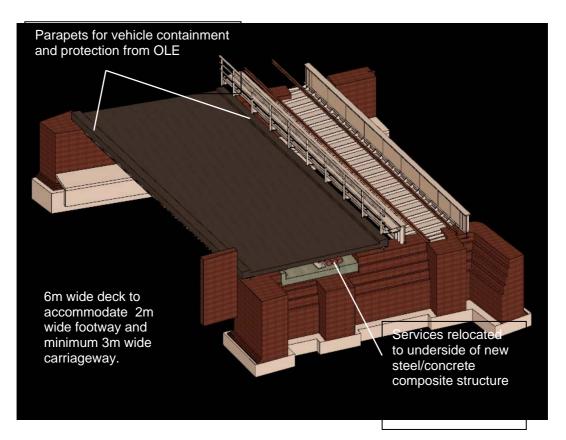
Sheepwash Bridge, isometric view on proposed decks 4 and 5
